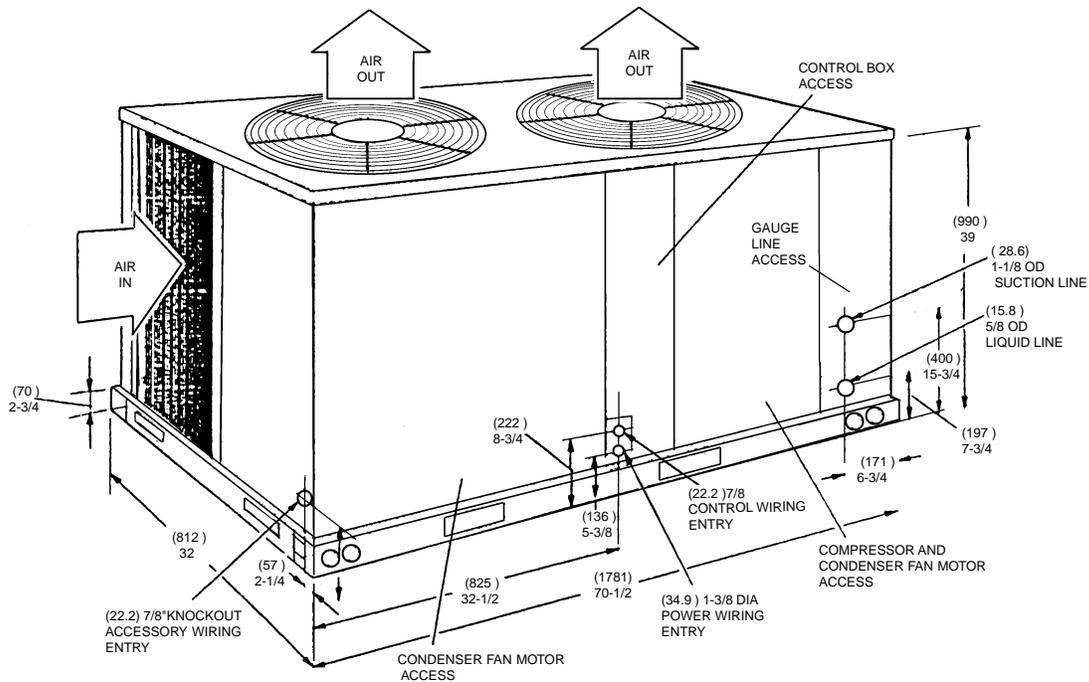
UNIT DIMENSIONS AND CLEARANCES
